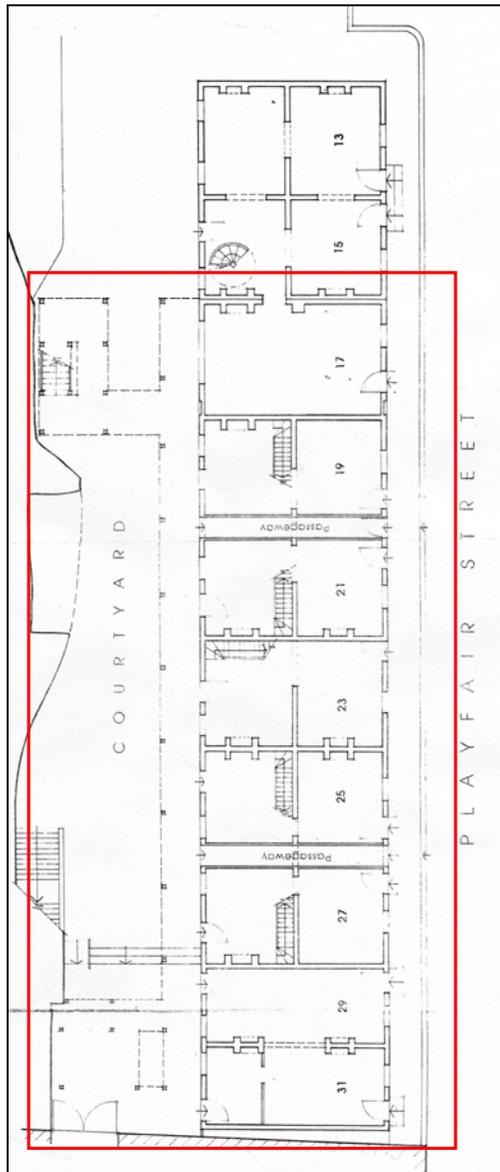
The measured ground floor plan prepared by Tropman & Tropman Architects.
